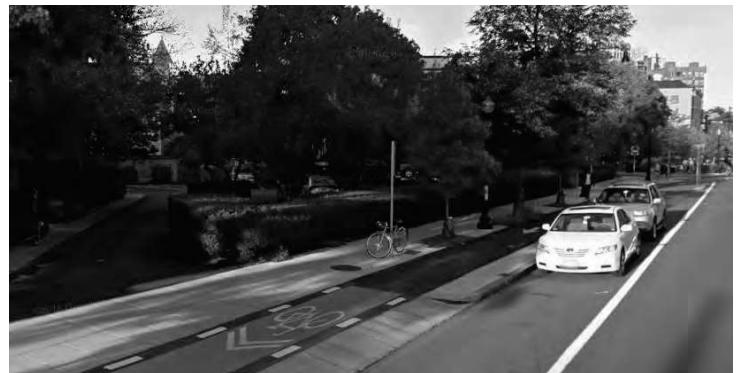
Example of bike lanes between sidewalk and on-street parking
